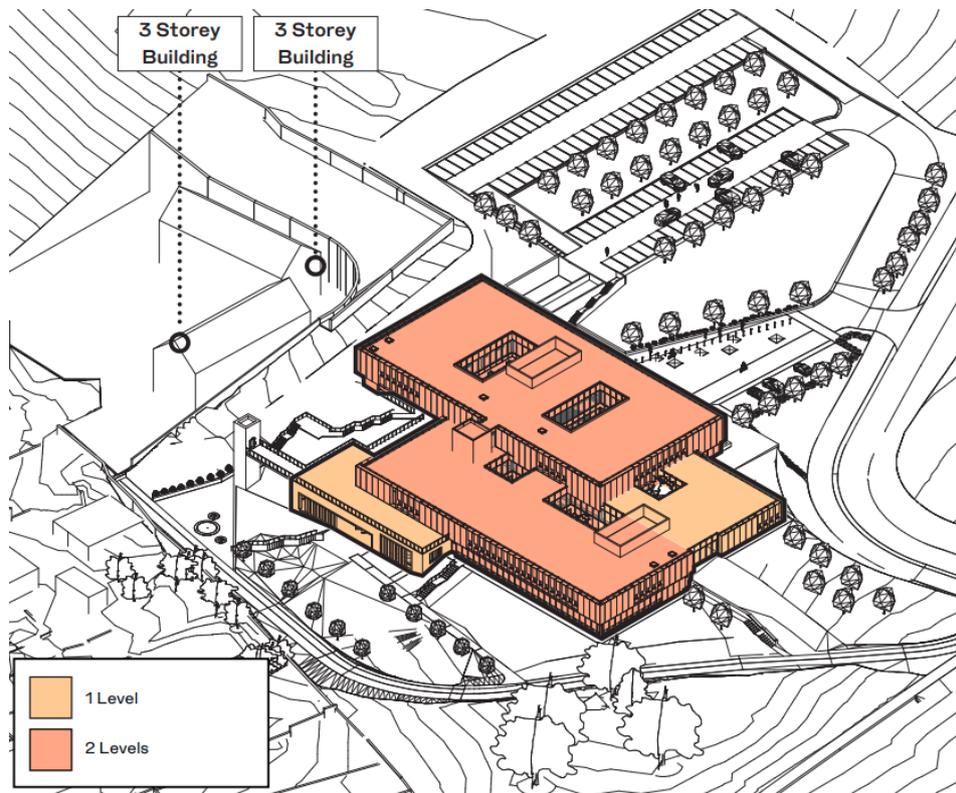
Massing Approach (Source: HJL Architectural Design Statement)
